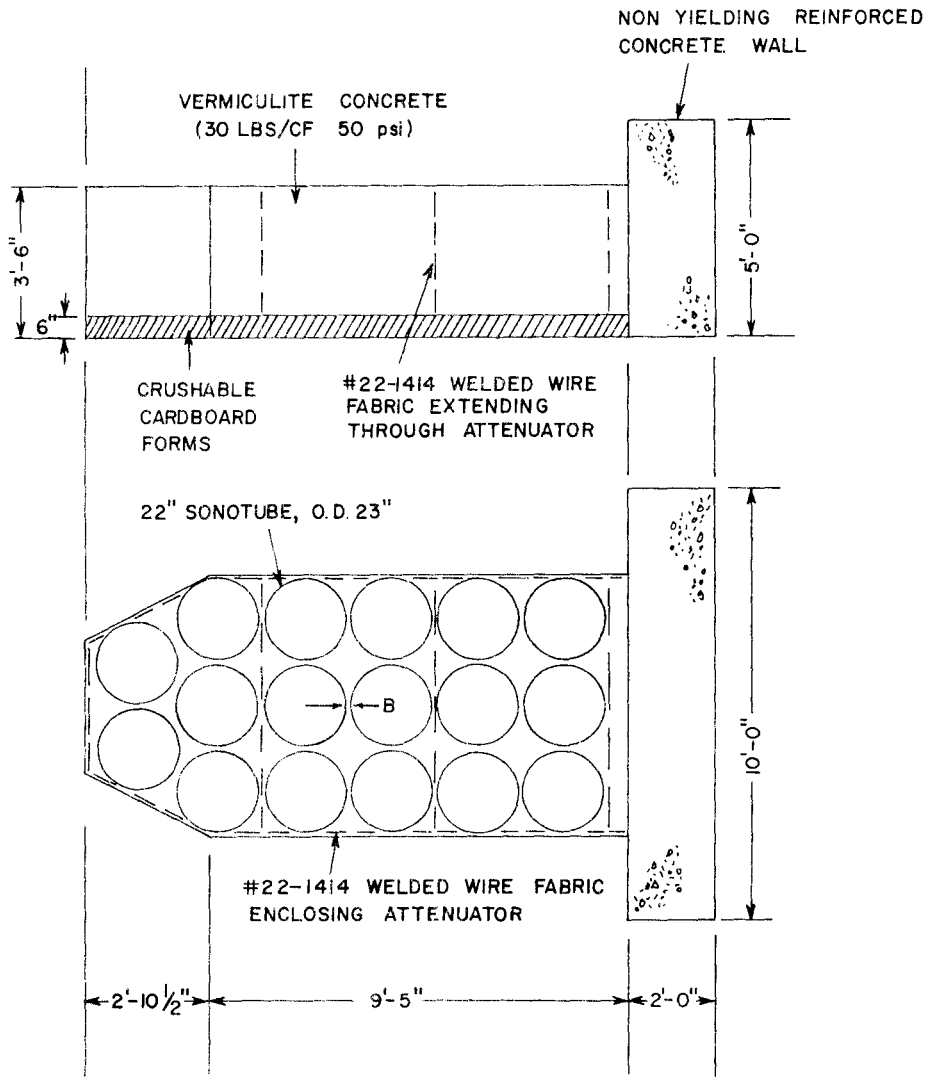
, CONCRETE CRASH CUSHION, TEST 505V-A
